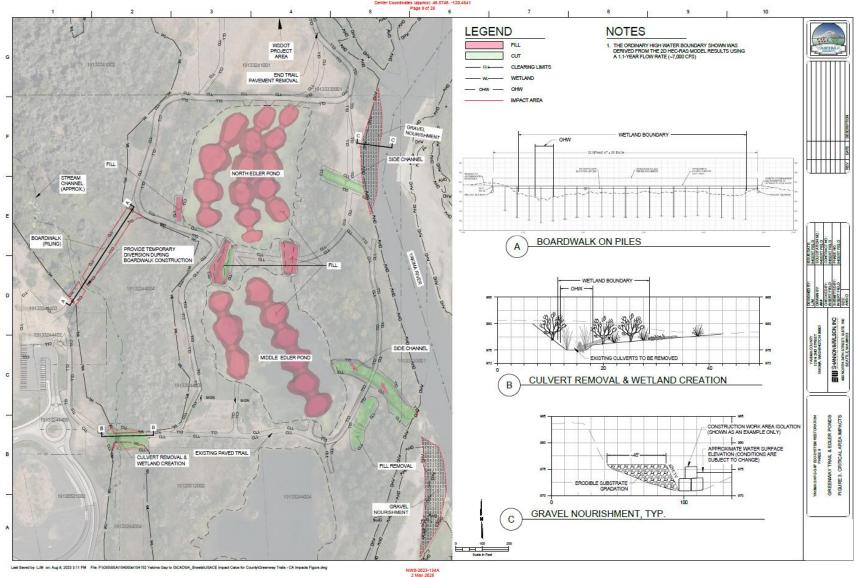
Greenway Trail and Elder Ponds Site Plan (excerpt from JARPA Drawings)
